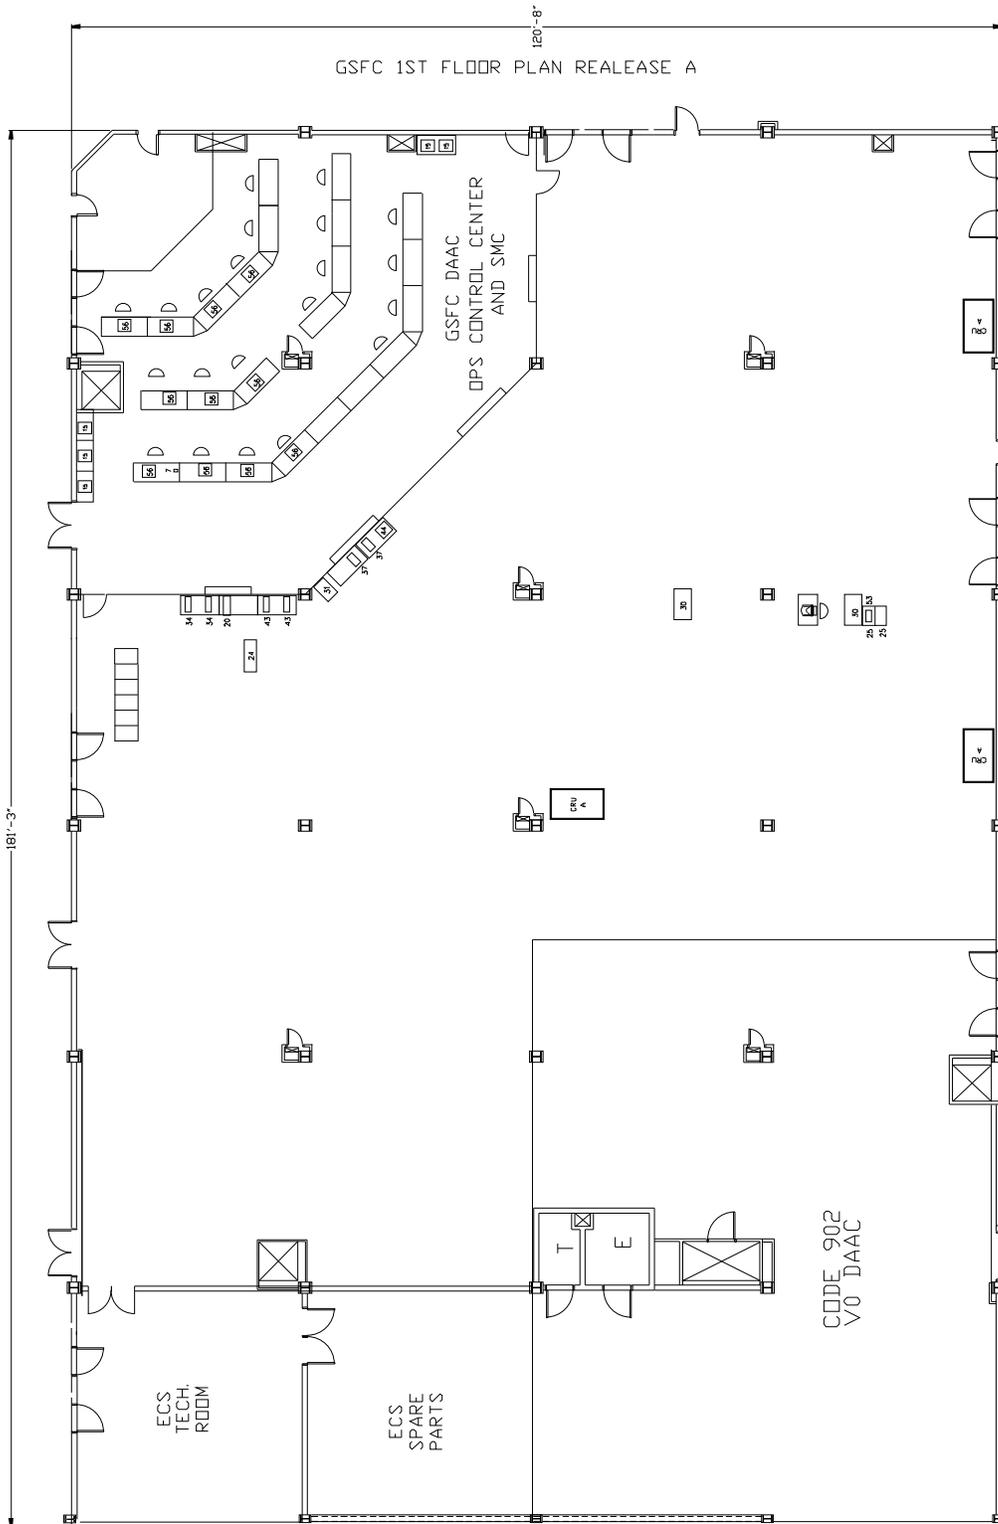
GSFC Floor Plan — First Floor (Release A)
